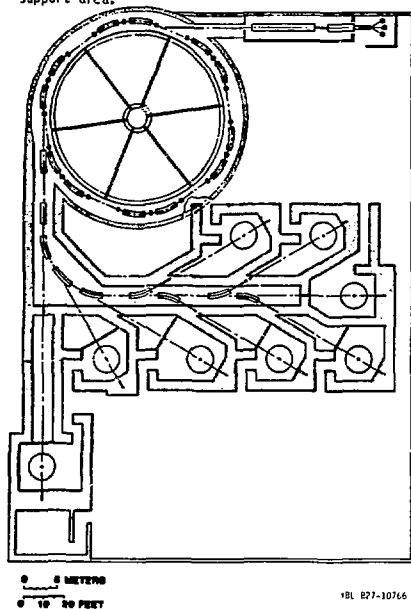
Conceptual plan view of the medical accelerator and 8 beam rooms.
